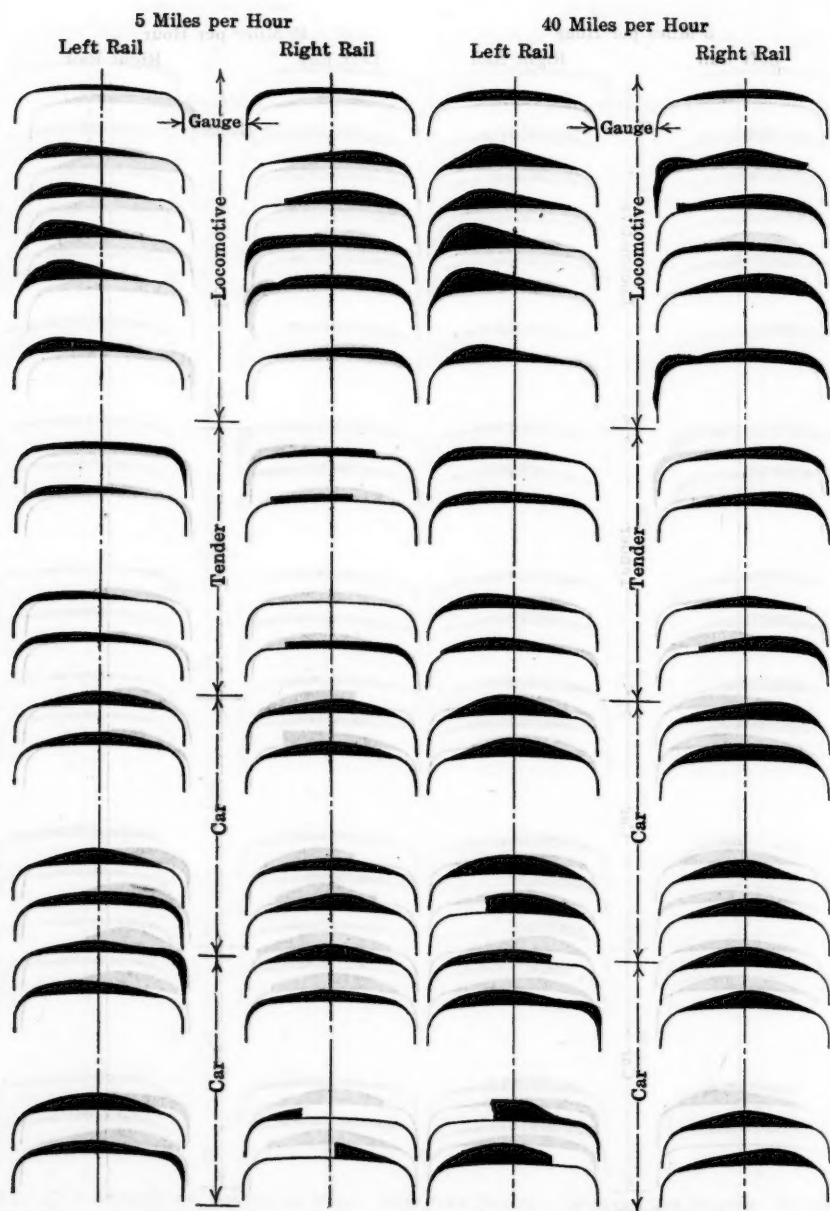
BEARING OF WHEEL ON RAIL. STRAIGHT TRACK. INCLINED TIE-PLATES. MIKADO TYPE LOCOMOTIVE AND CARS. READING COMPANY.
